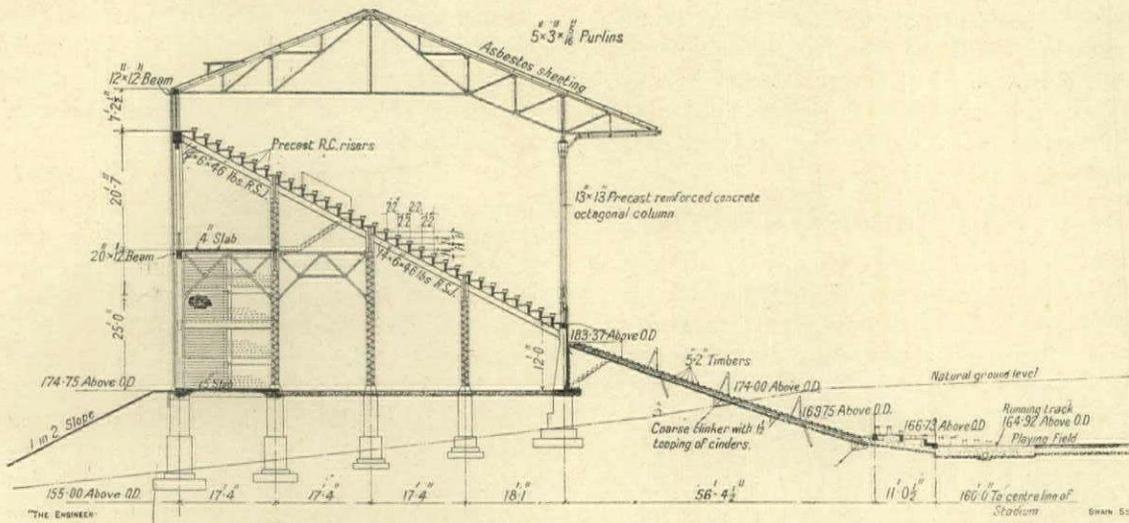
TYPICAL CROSS SECTION THROUGH STAND, WEMBLEY PARK STADIUM, LONDON, ENGLAND
